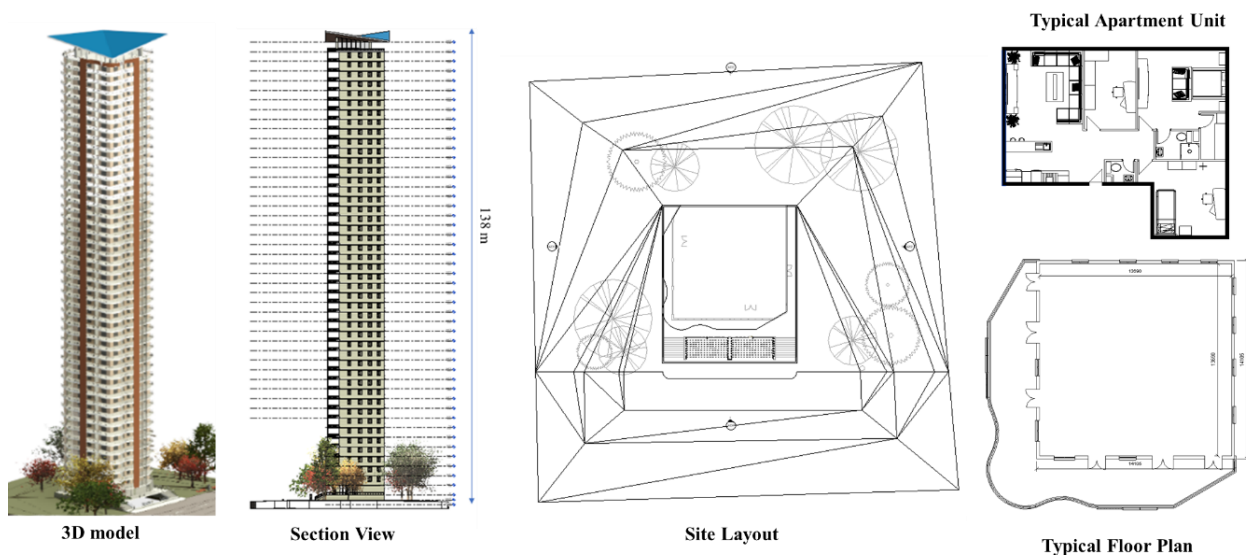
Architectural layout of the selected building, showcasing elevation, site plan, unit layout, and ground floor design
